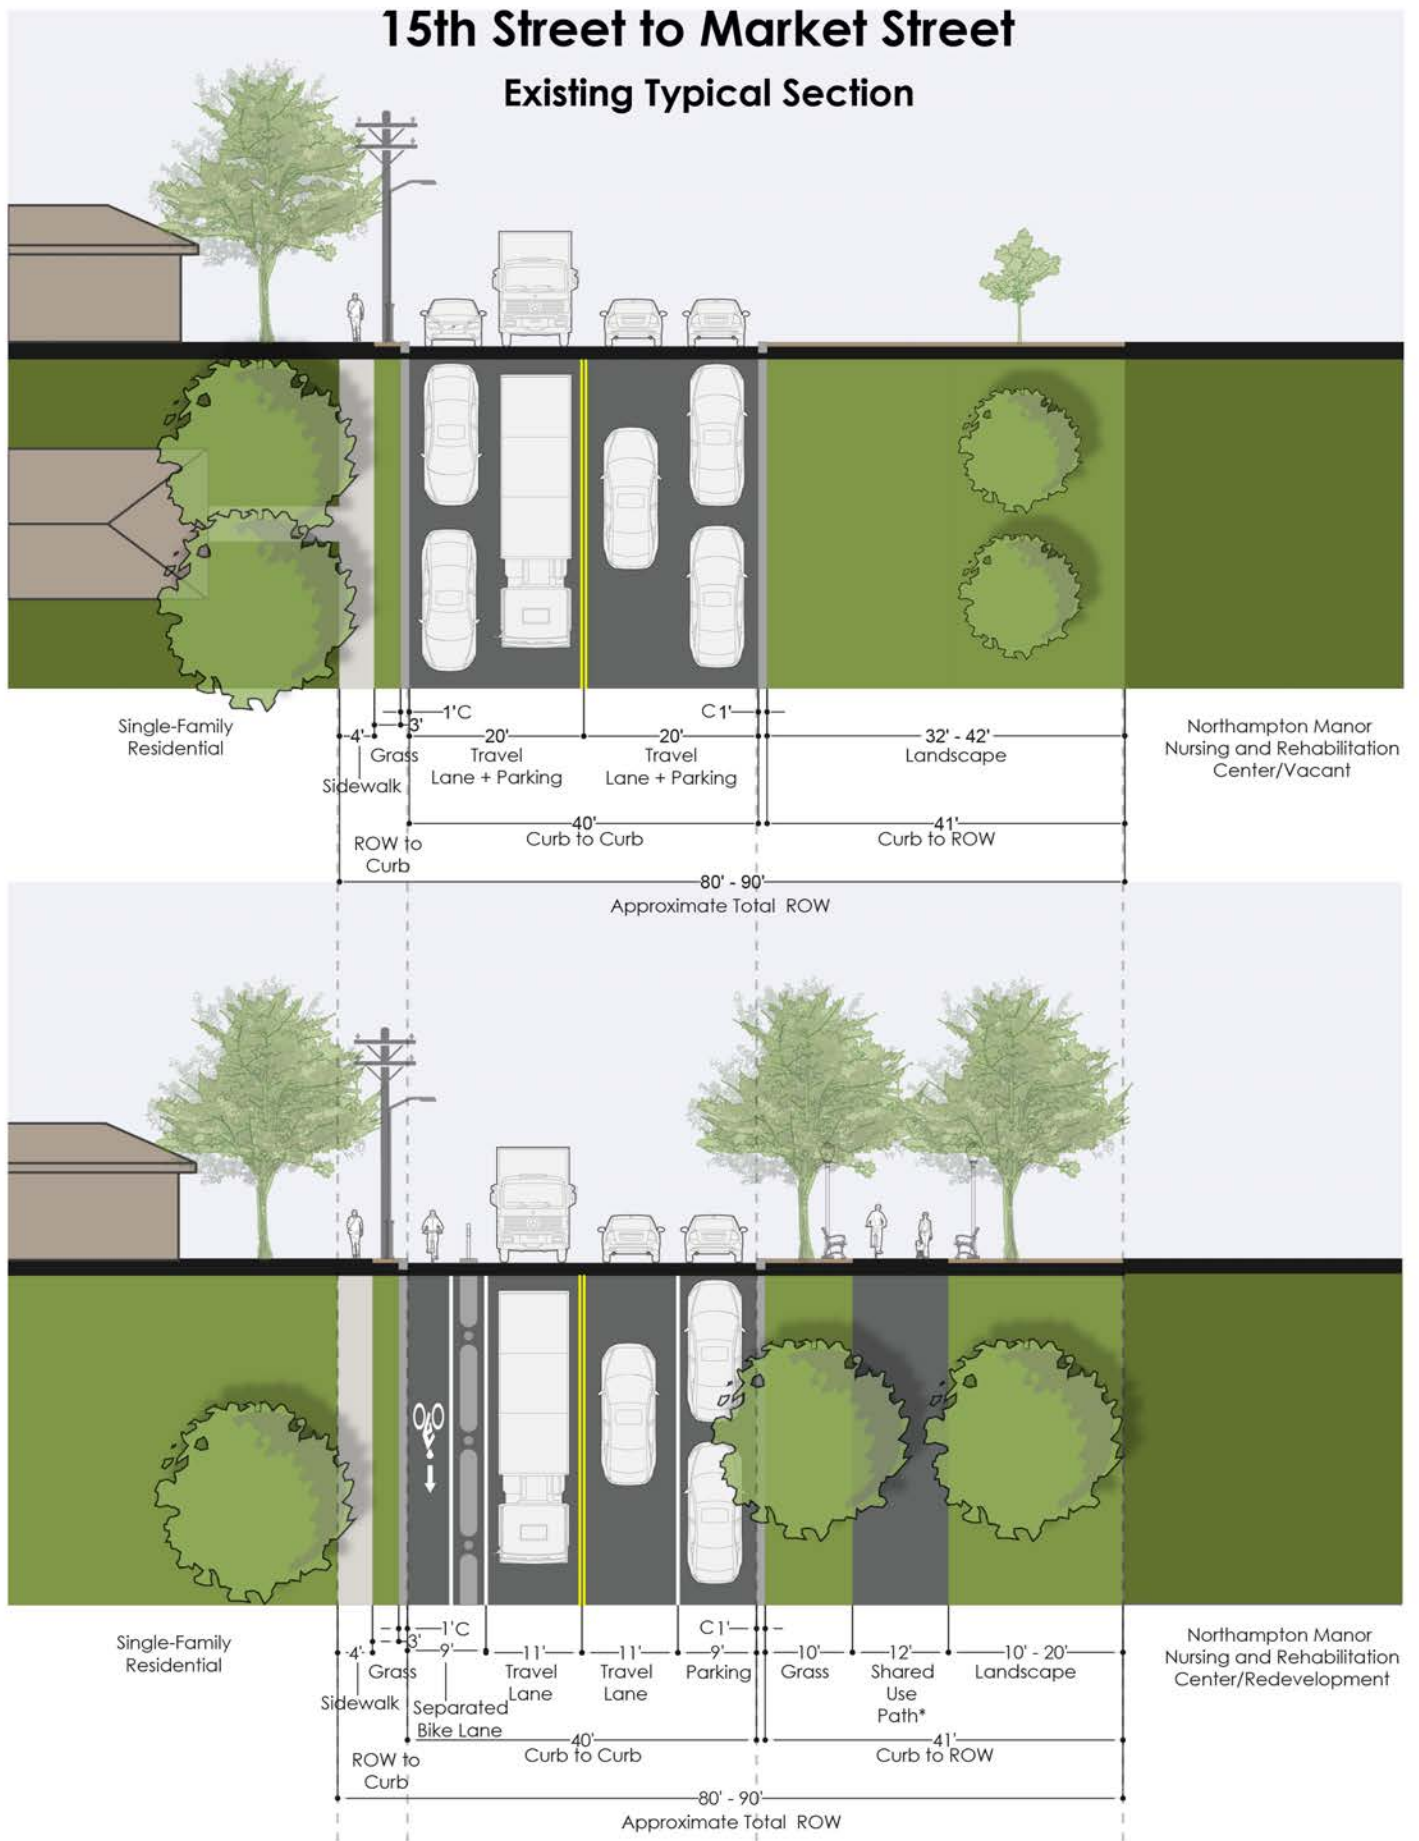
Existing and Proposed Typical Section - 15th Street to Market Street
